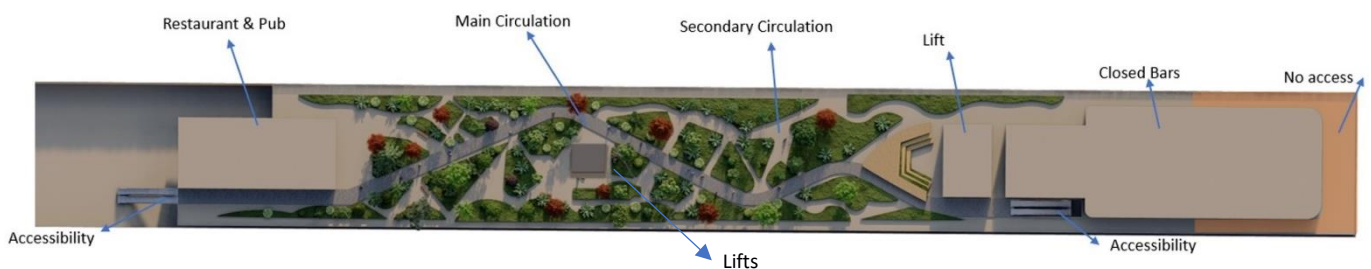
Crossrail Place Roof Garden Layout, Canary Wharf, London. Source: Author's Digital Model.
